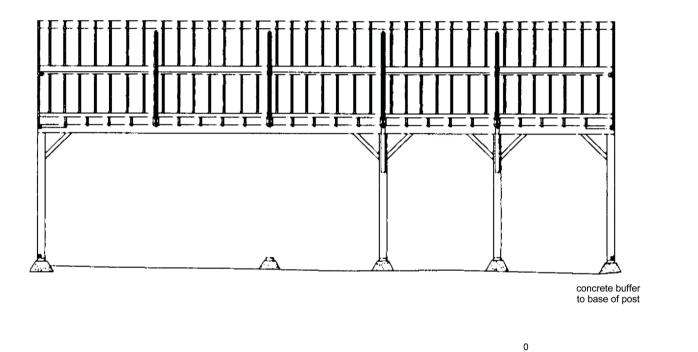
Structure 5, 1898-1918 Dutch barn north-west elevation.
